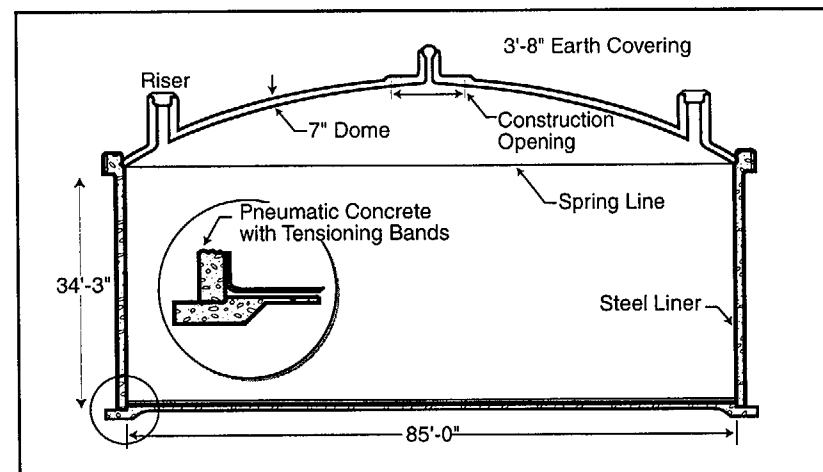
C. Uncooled Waste Storage Tank, Type IV (Prestressed concrete walls, 1,300,000 gallons)
